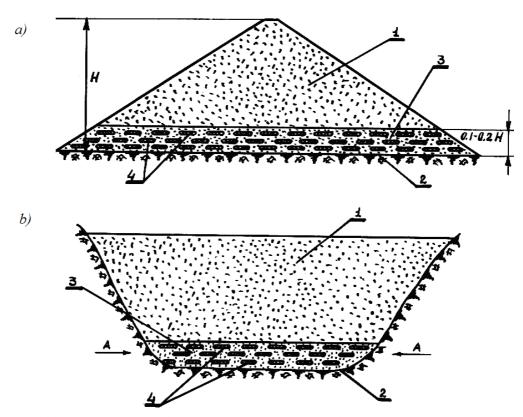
Earthquake-resistant ground dam, built in wide sections: a) cross section; b) longitudinal section.
